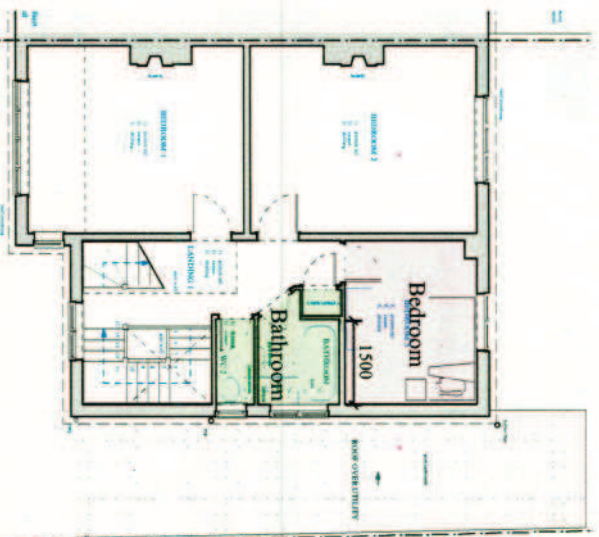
Existing small first floor bathroom (not able to fit a full size bath) & small 3rd bedroom at 1st floor
